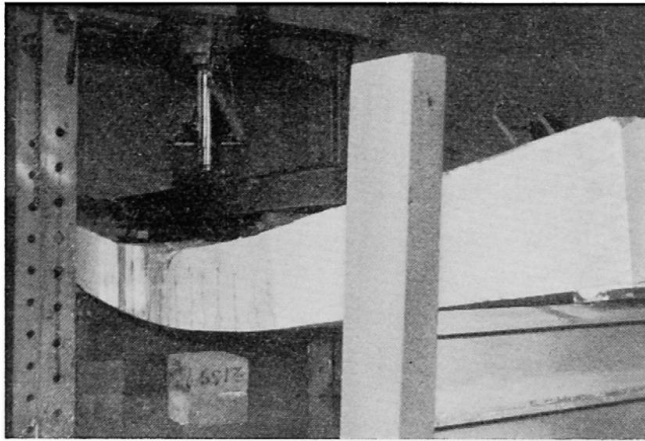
A beam with a bent plate joint and failure due to crushing of the concrete.
